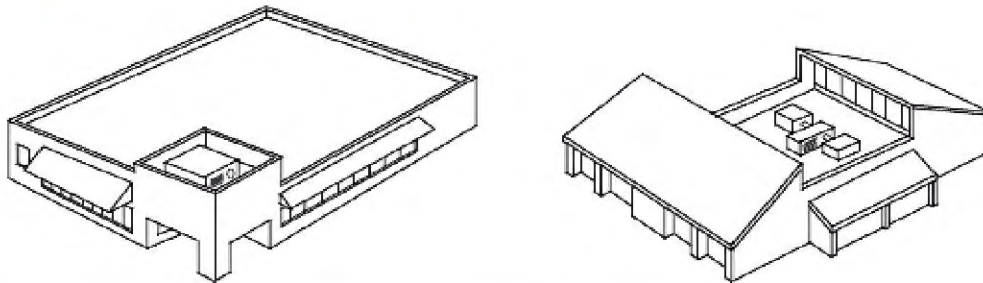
B.4.1-1. Examples of how to screen roof-mounted mechanical equipment.
